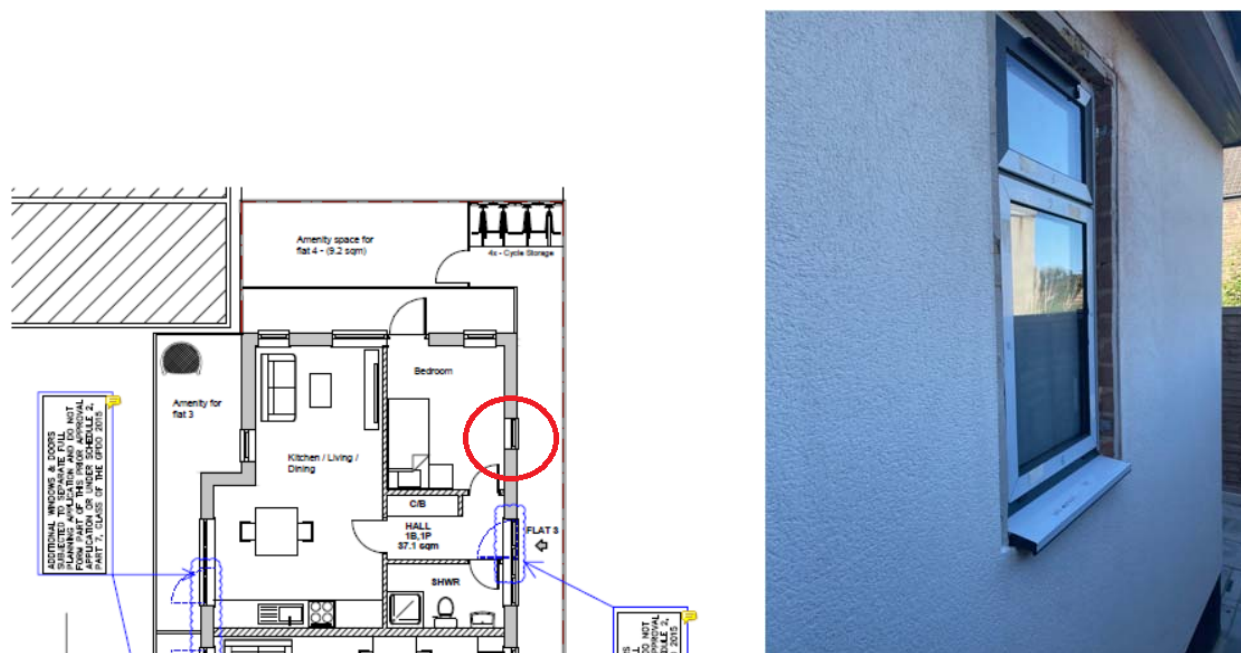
Floor plan from application 21/05000/GPDO (left) and photo showing the installation of such window on site (right)
